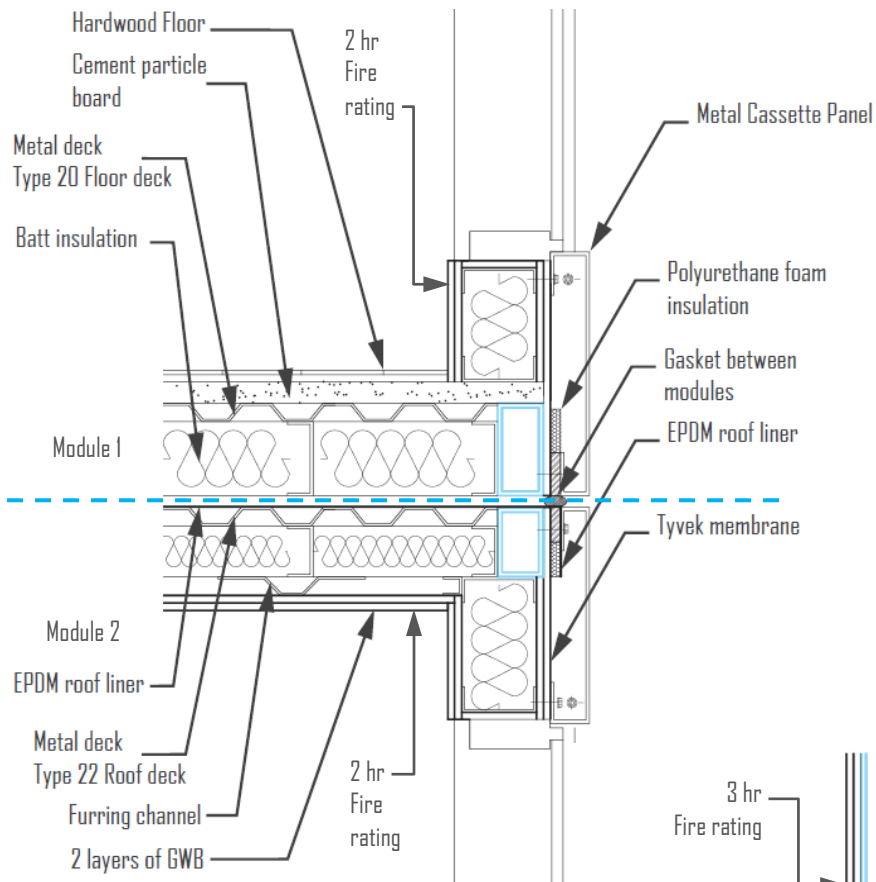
Section through beams between two stacked modules roof and floor assemblies
